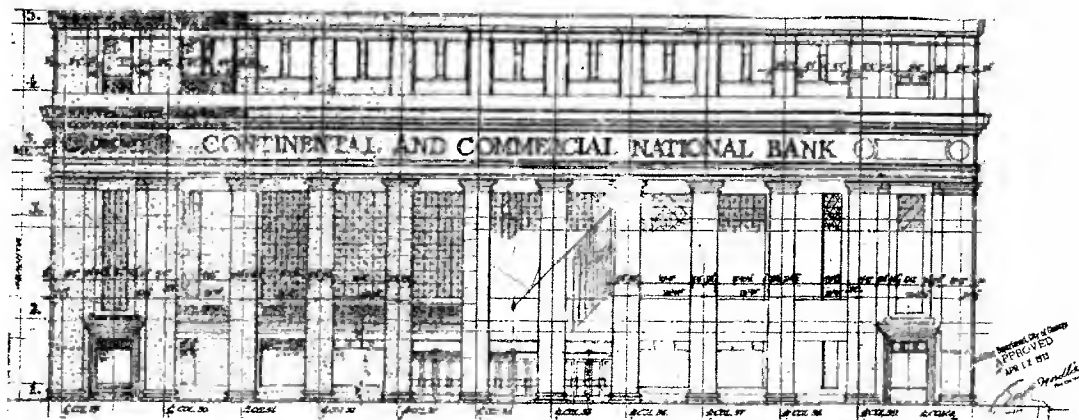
Burnham's 1913 drawing of the Continental and Commercial National Bank Building La Salle Street façade
